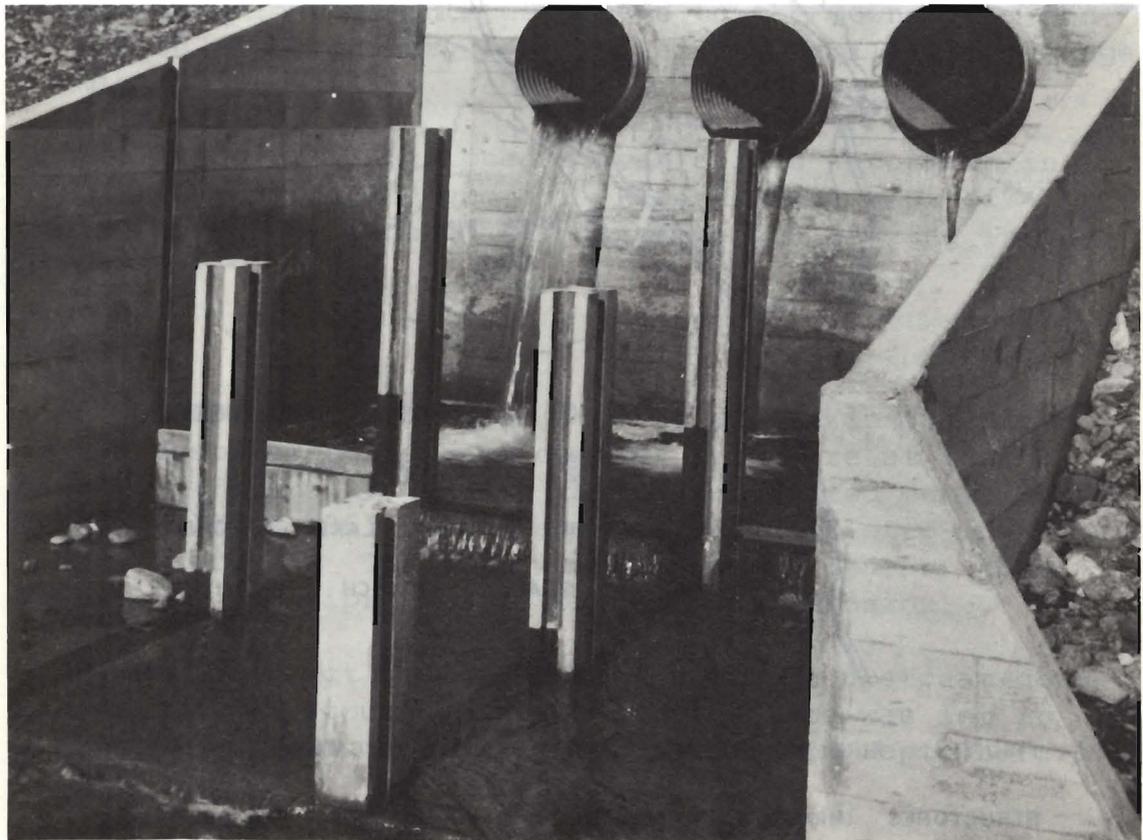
View of the combination fish ladder and trapping facility at outlet of Lower Fire Lake.
